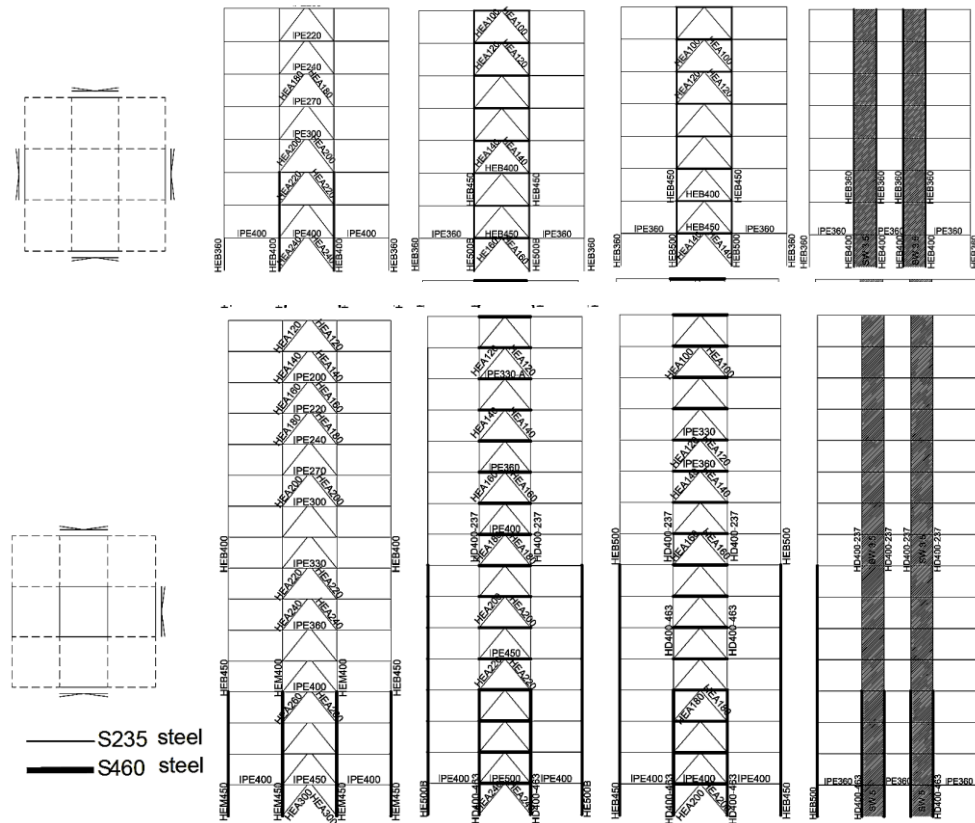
Frame systems: (a) plan view and elevation of EBF8, CBF8, BRB8 and SW8 structures; (b) plan view and elevation of EBF16, CBF16, BRB16 and SW16 structures
